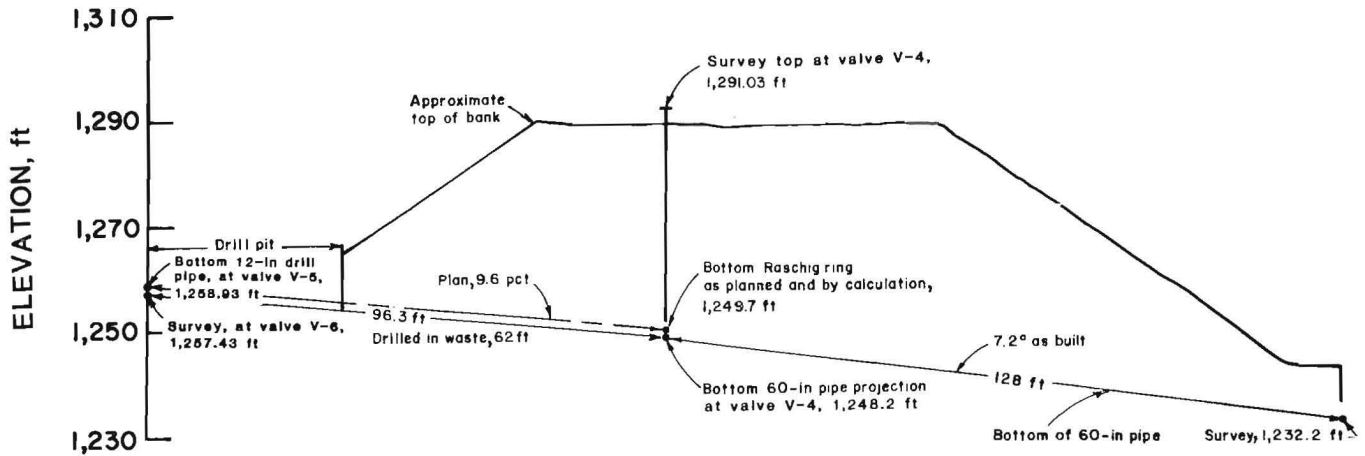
Horizontal drilling setup for 60-in tunnel liner and two 12-in afterburning air ducts (V-5 and V-6).
